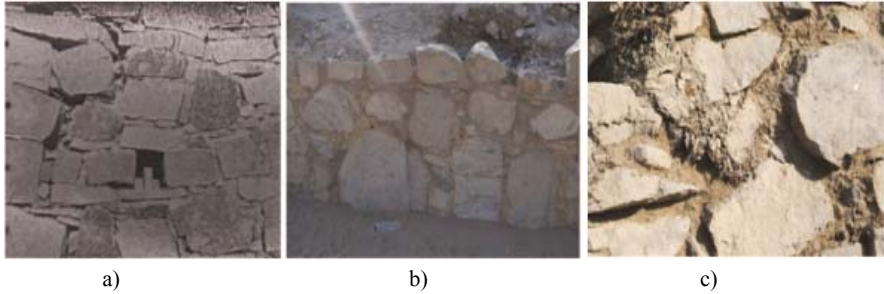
a) Stone wall in Chankillo [7], b) Stone wall in Caral c) Stone masonry with clay mortar and vegetal fiber in Caral.
